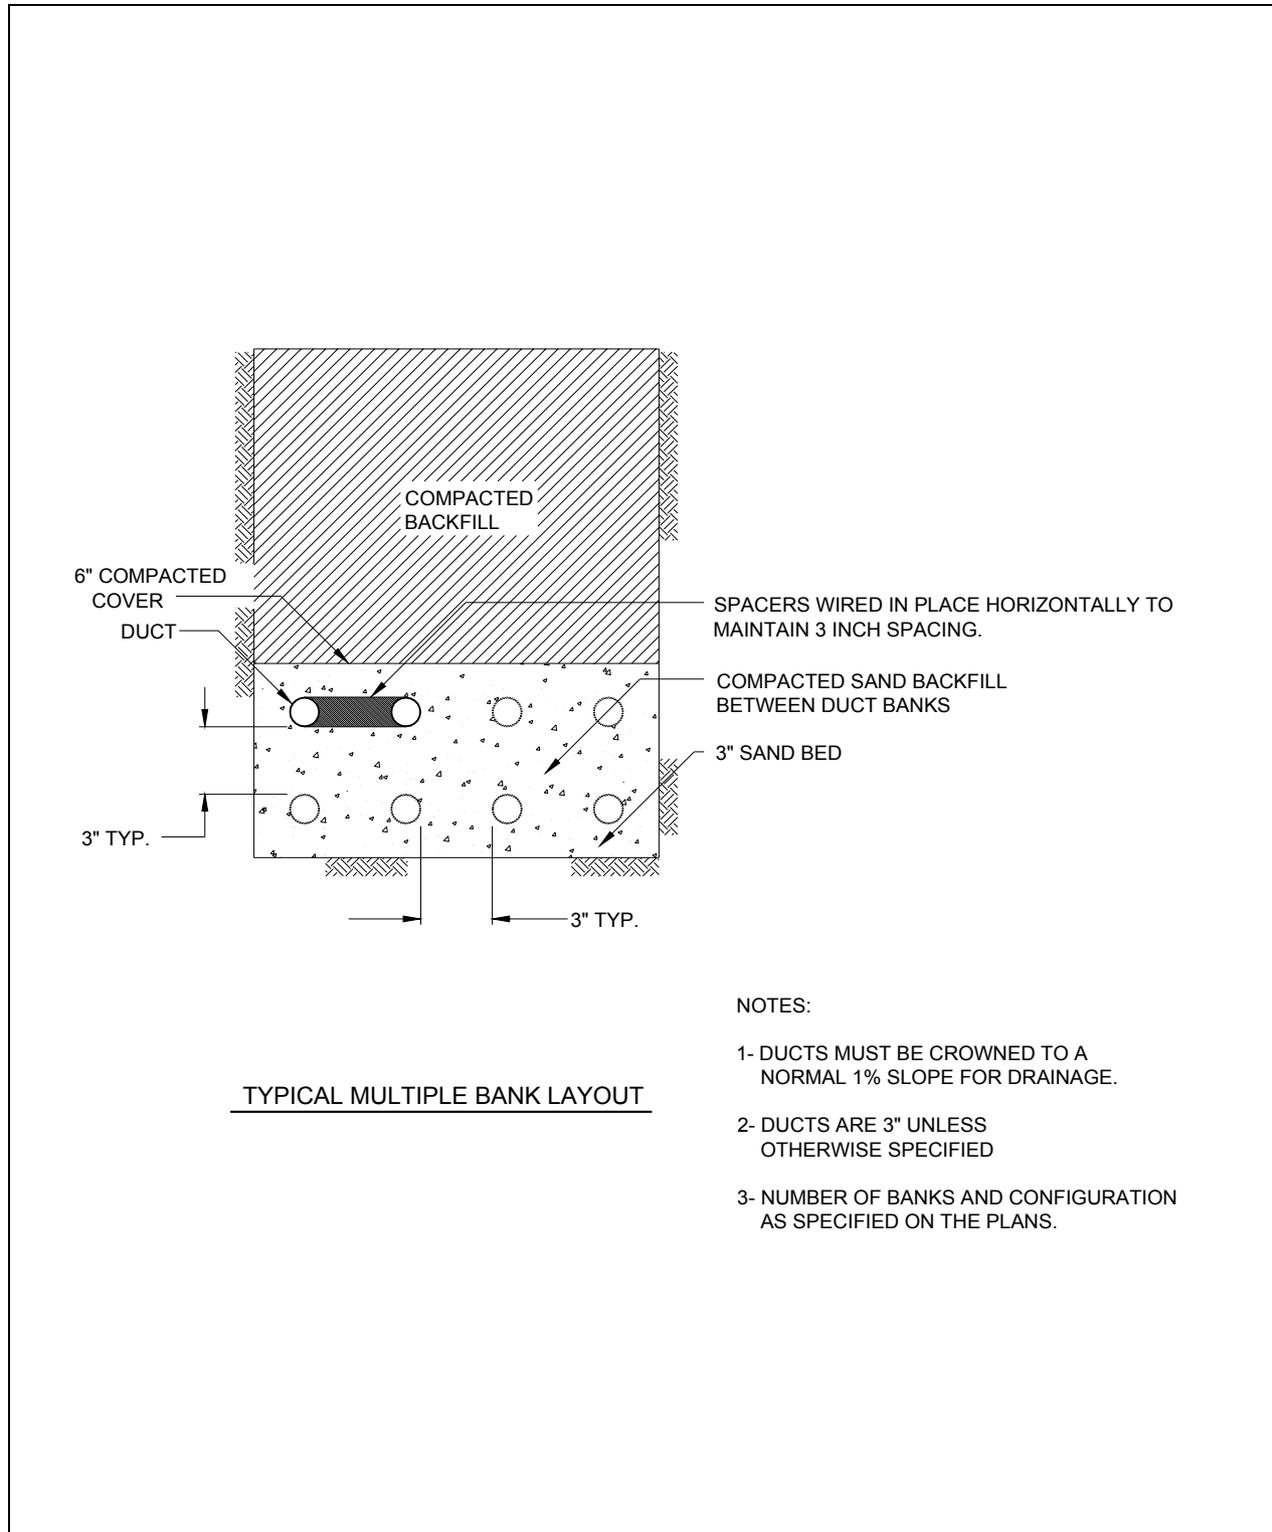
Standard Details for Underground Cable Installation –Typical Multiple Bank Layout
